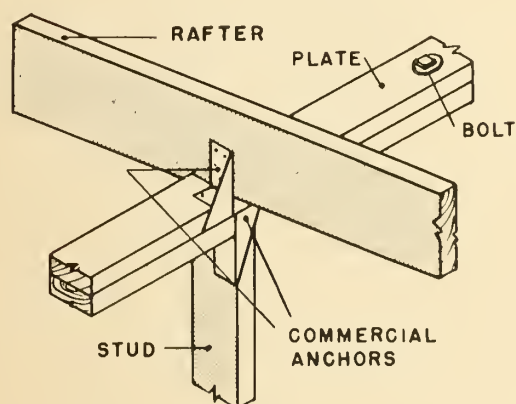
Commercial anchors used to tie plates to studs and rafters to plates.
